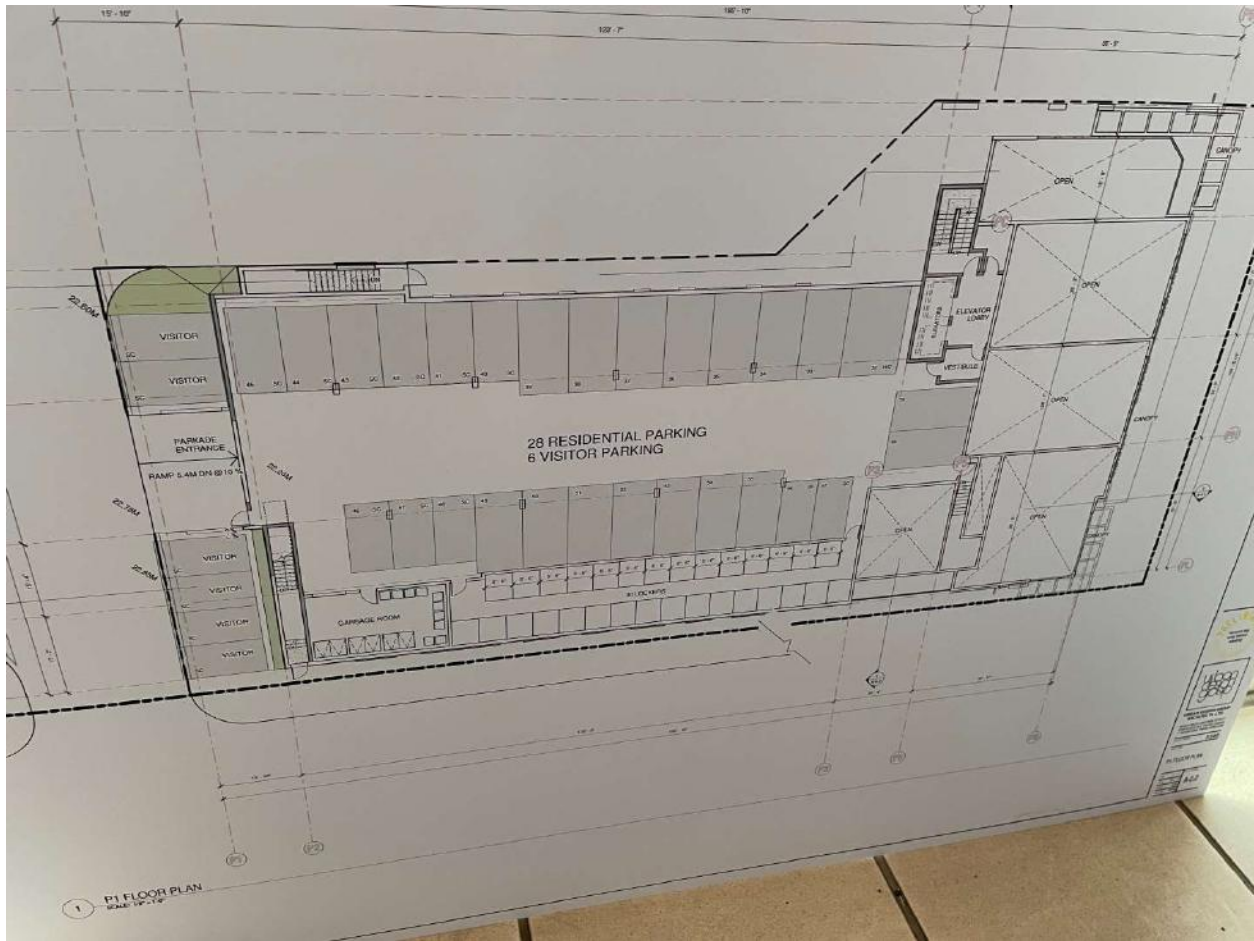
Chart showing the P1 Parking Plan with six outdoor VISITOR parking spaces.
